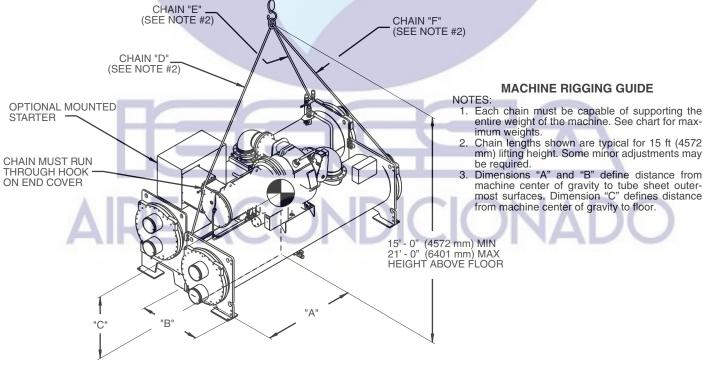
Machine Rigging Guide (Heat Exchanger Size 10 Through 7R) with Free-Standing or Unit-Mounted Starter
